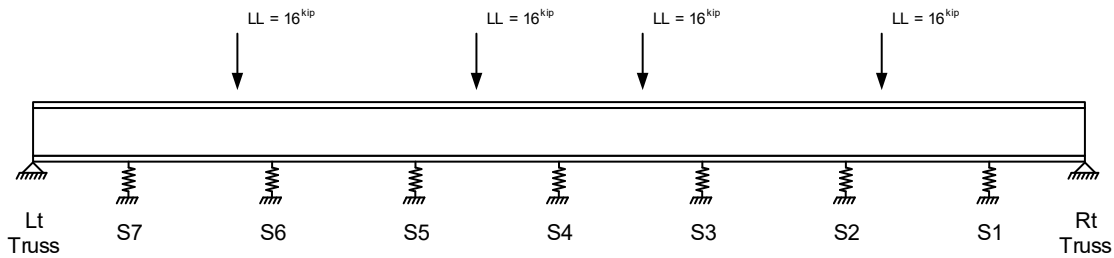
Live Loads for Bloody Bridge Floor Beam
